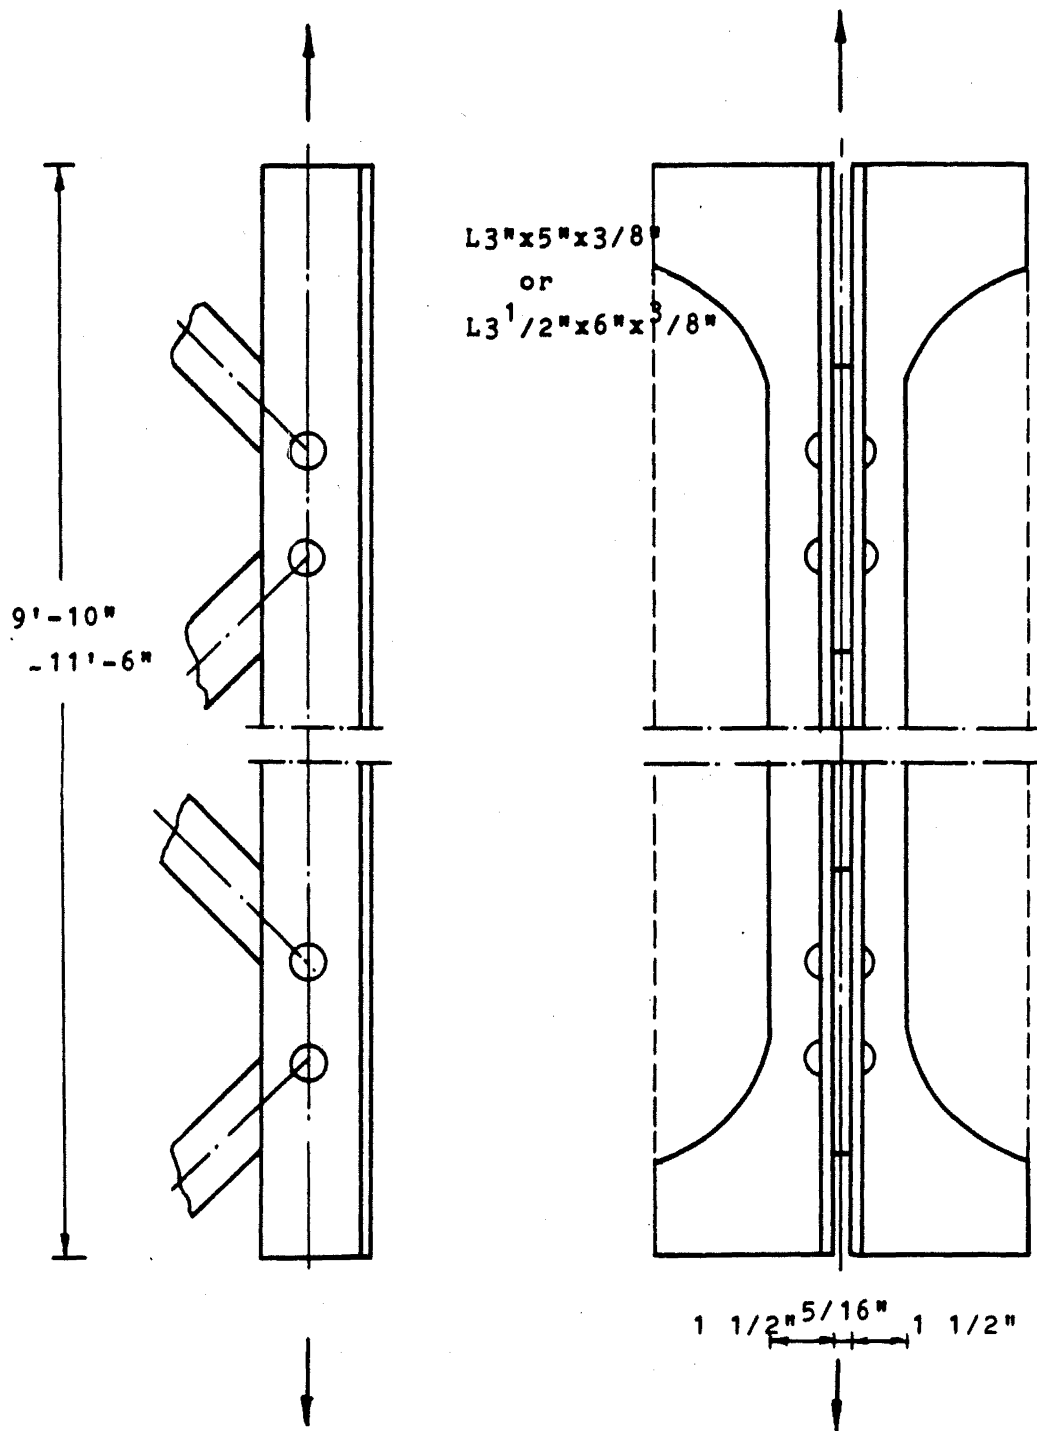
Riveted Test Specimen Fabricated from Highway Truss Bridge Hangers (see Ref. 3)
